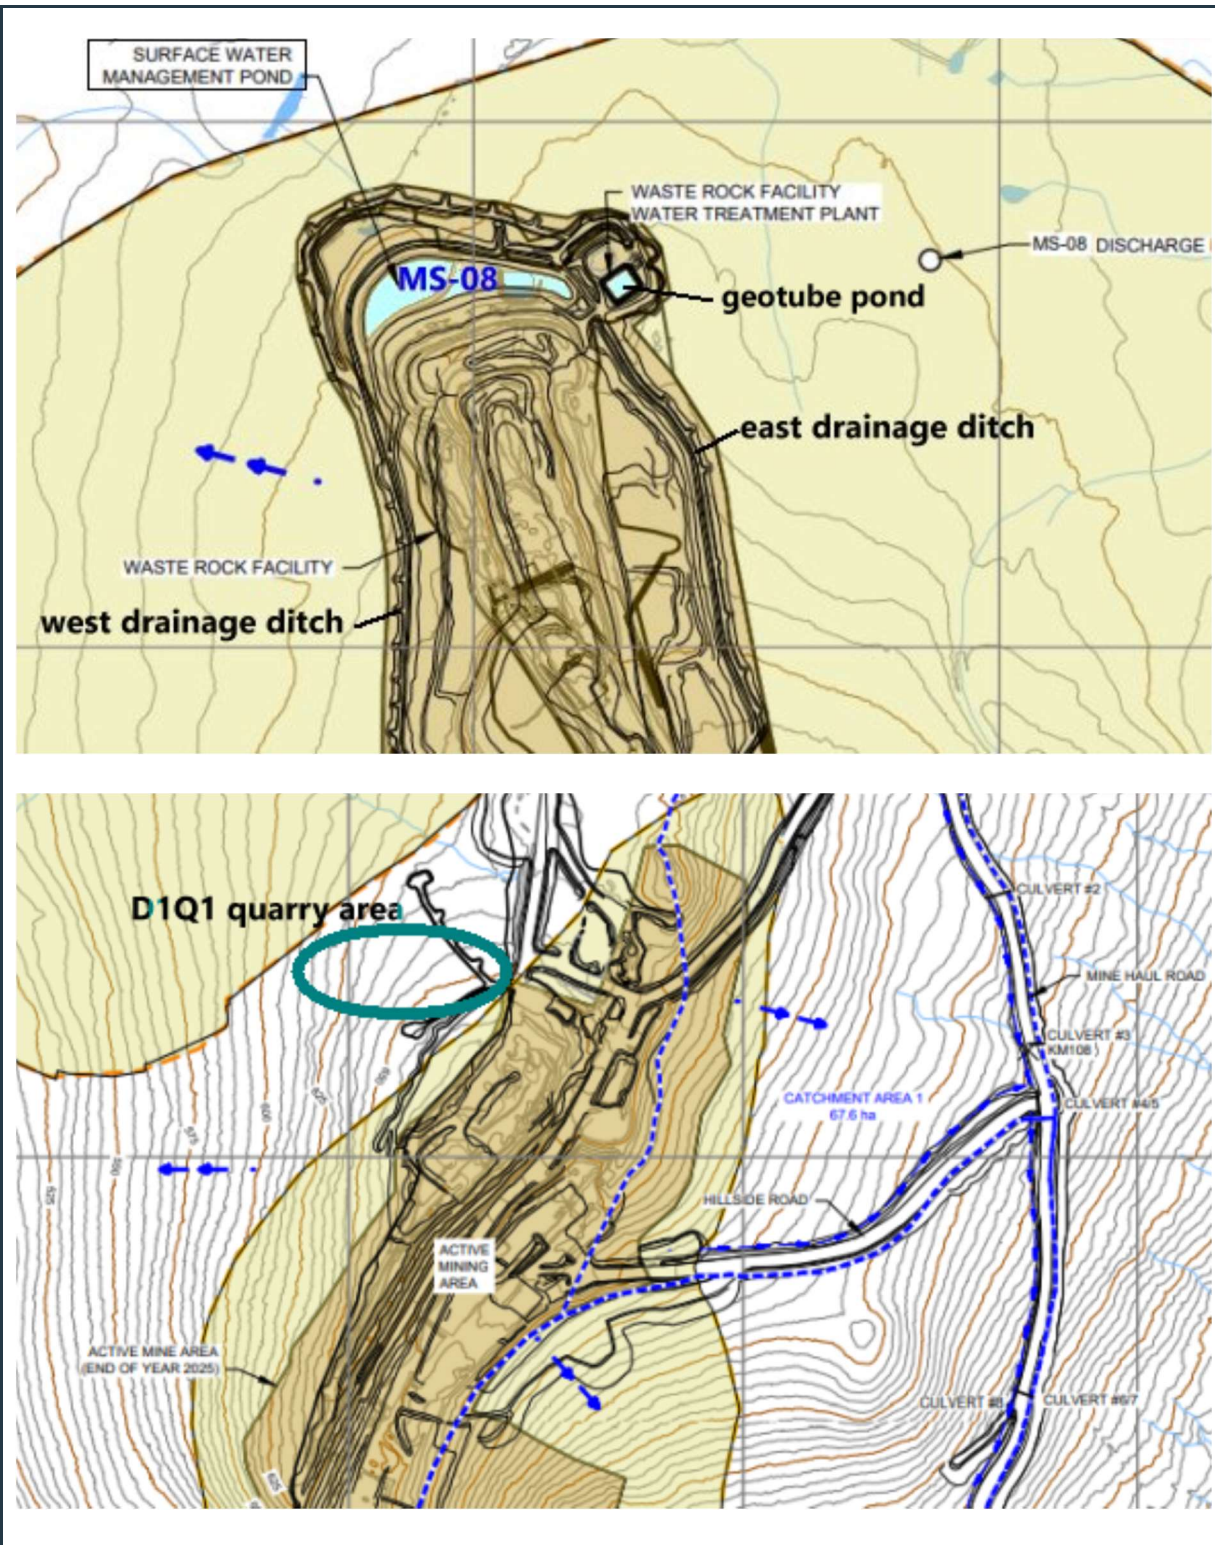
Mary River Site layout – North-Eastern Zone – Waste rock facility with the MS-08 and geotube ponds – Active Pit #1 and D1Q1 rock quarry areas.
